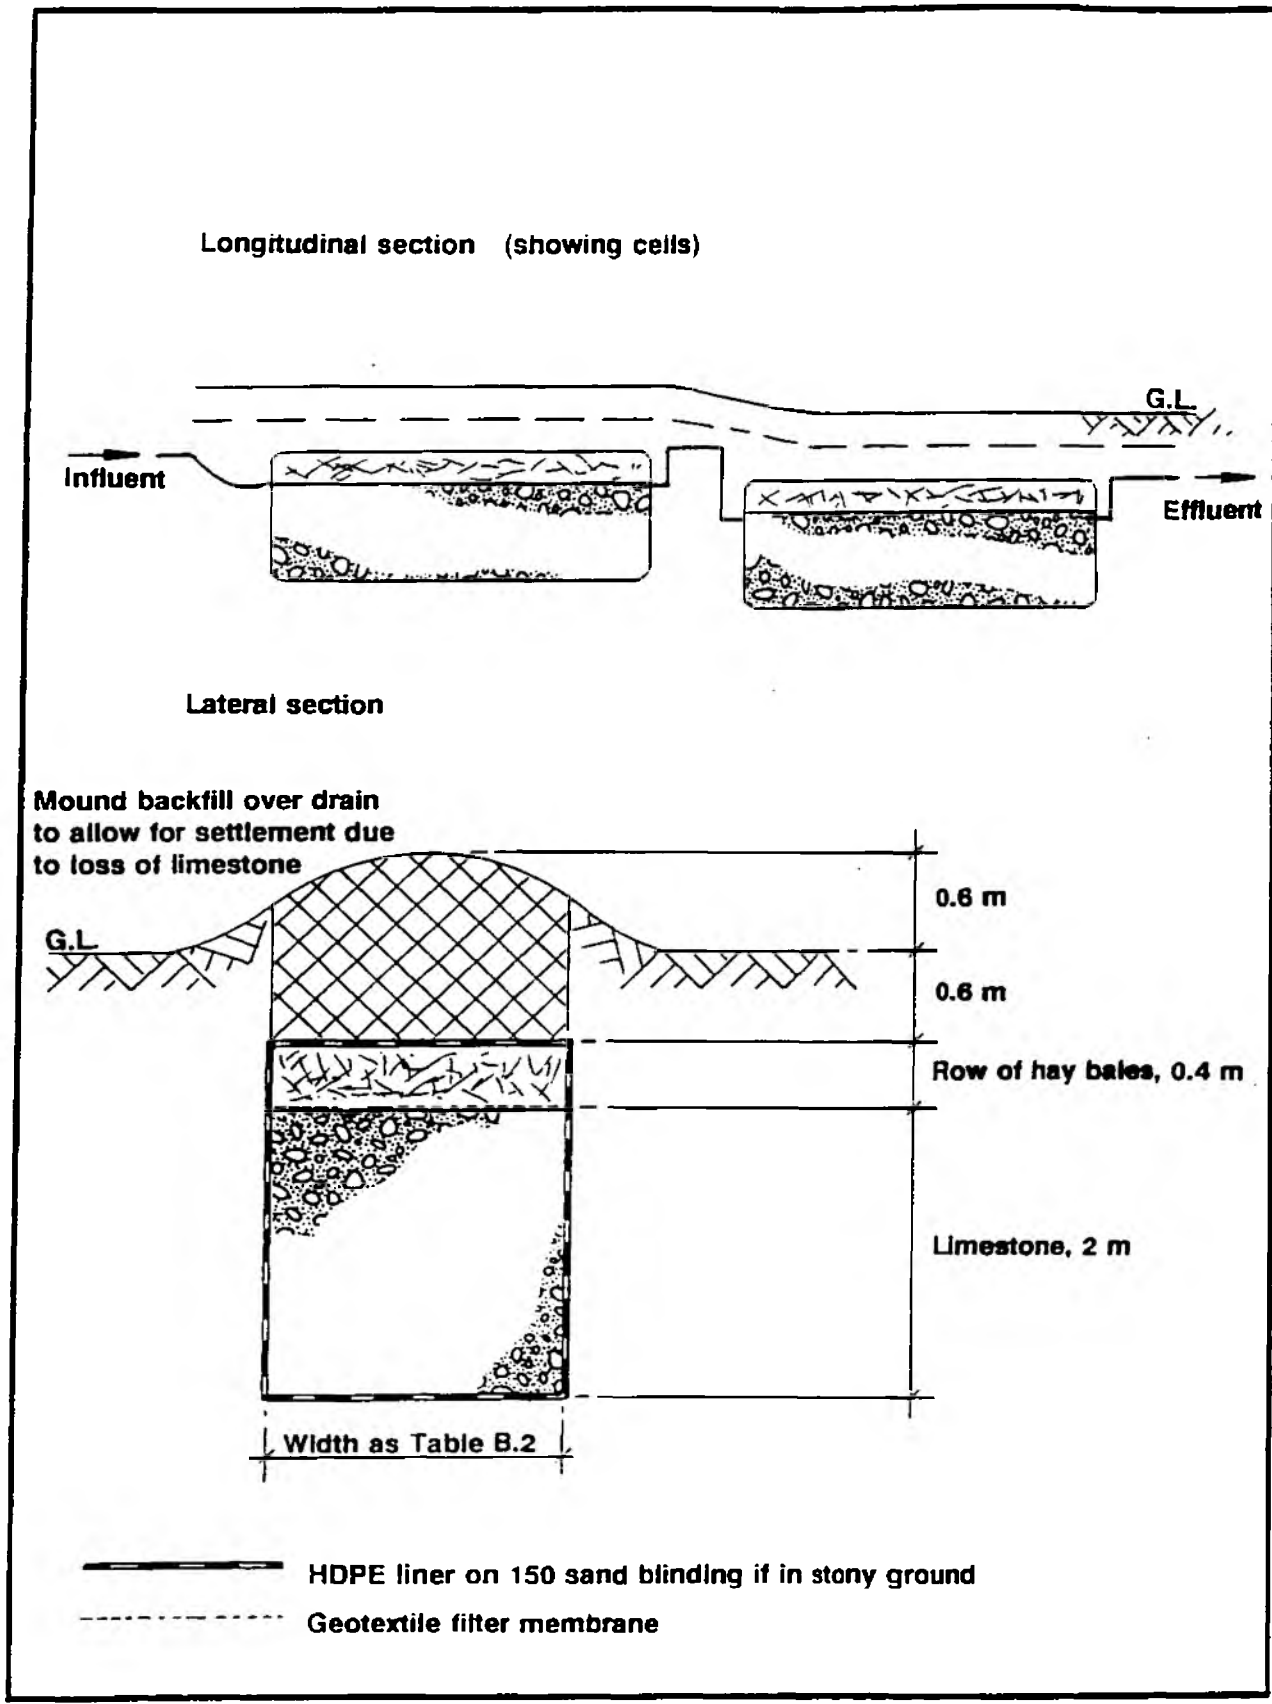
Typical sections of Anoxic Limestone Drain.
